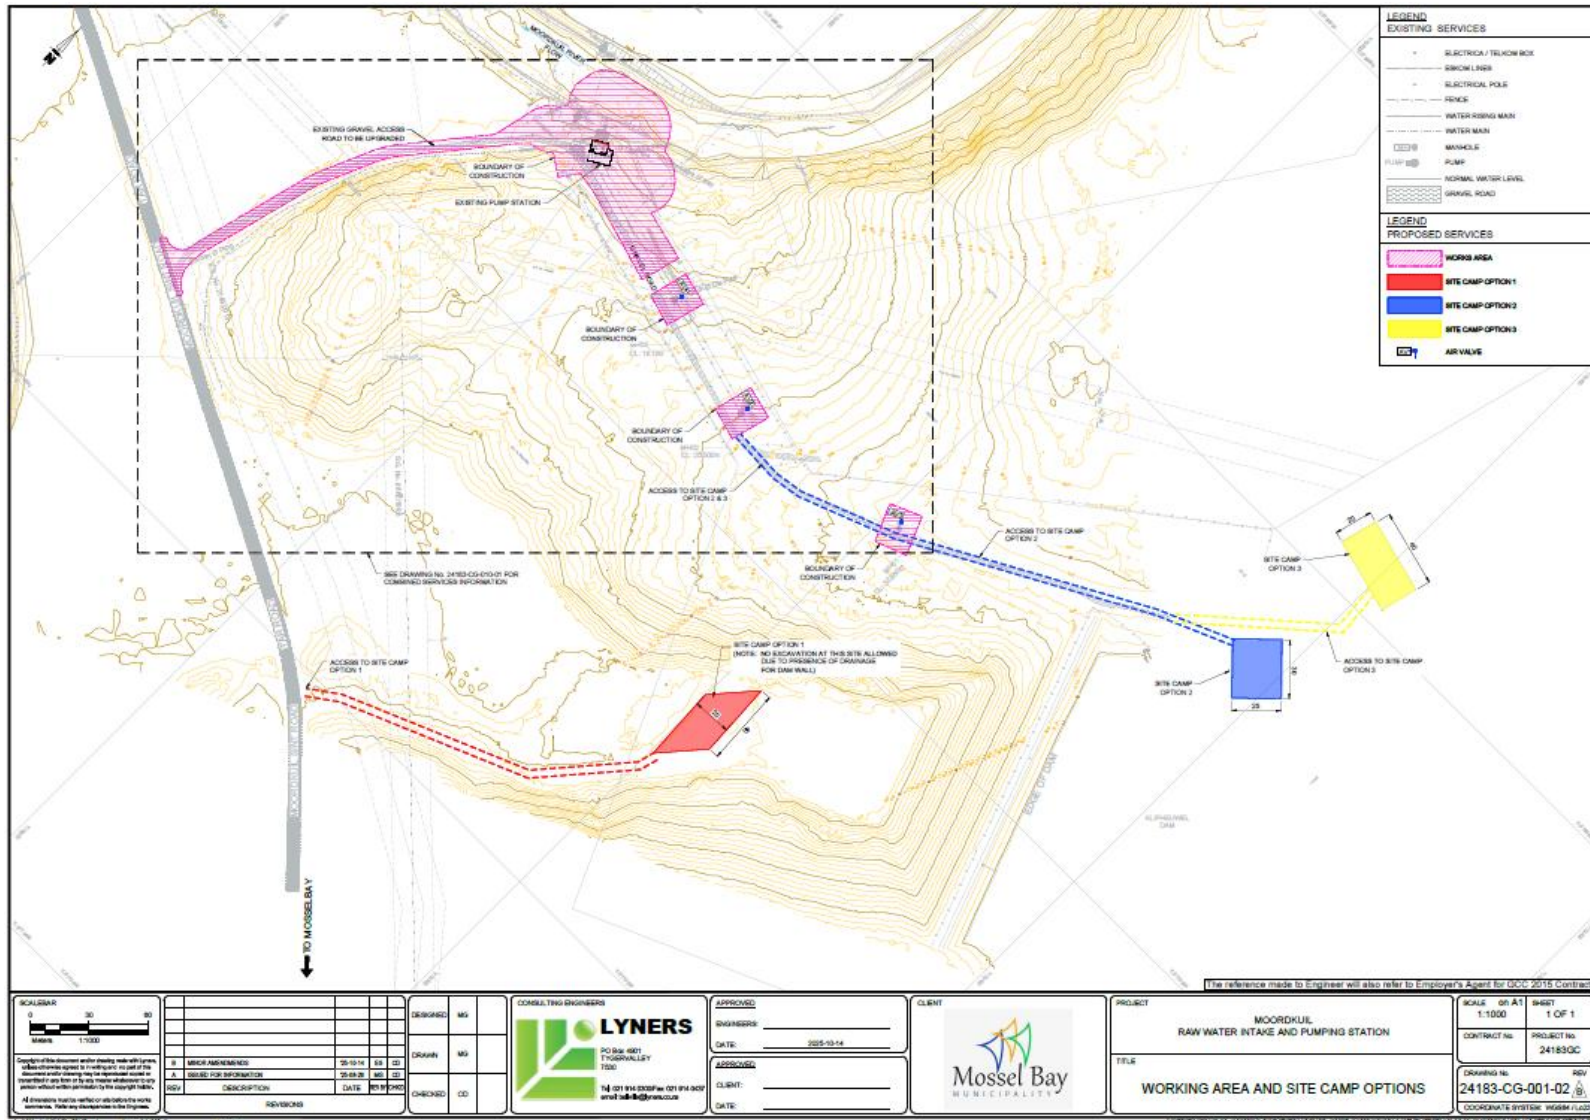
Site Layout Plan showing the proposed construction activities as outlined and three site camp alternatives.
